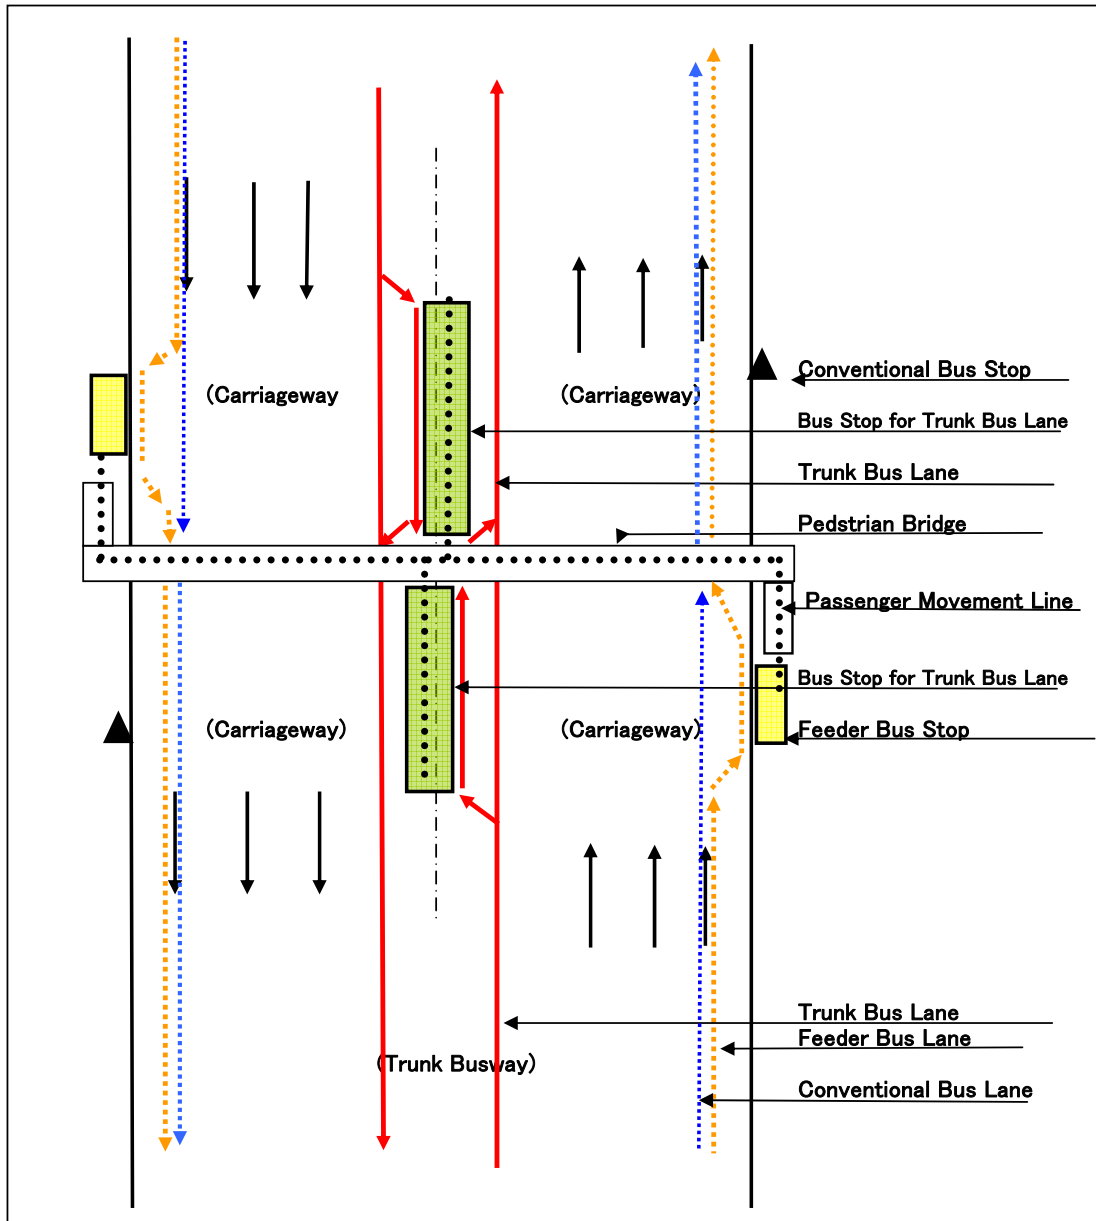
Conceptual Plan of Trunk Bus Station
